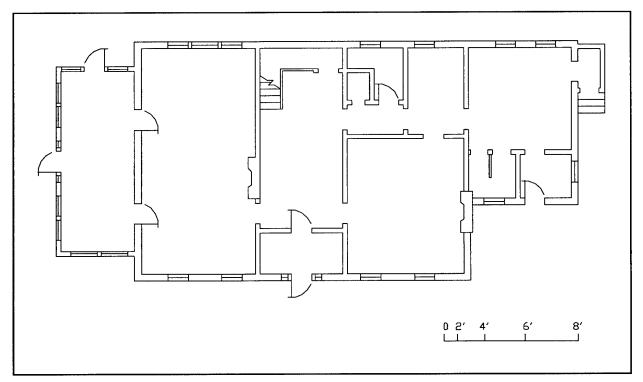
Example of a Dutch Colonial house floor plan (Building 376).
